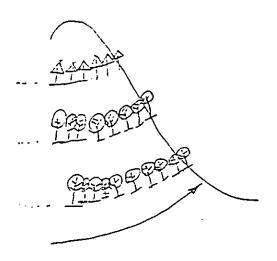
In case of avoiding cutting/banking slope when constructing forest road in places where landslide are expected to occur.
